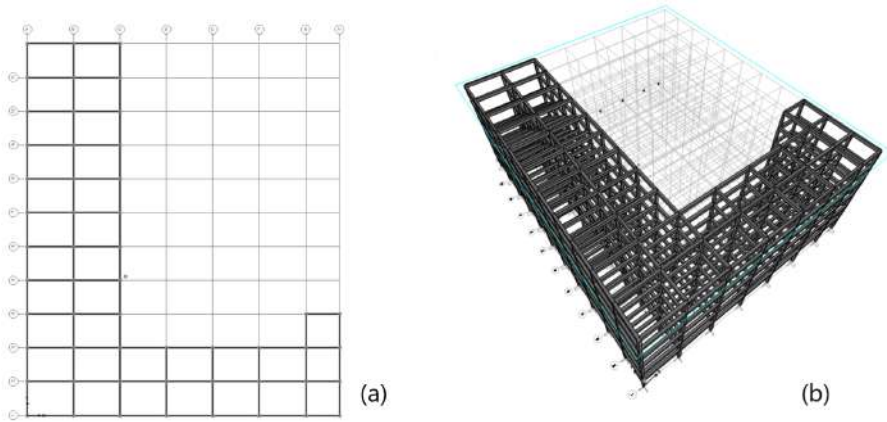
(a) View in plan of contest structure (b) 3D View of contest structure
